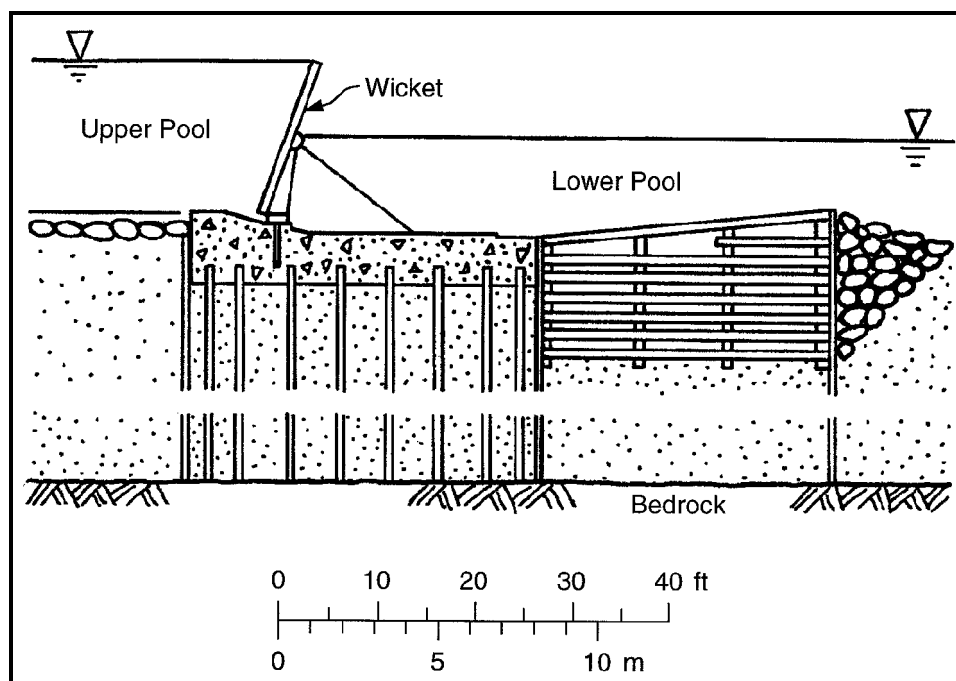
Typical section of a navigable pass portion of a wicket dam
